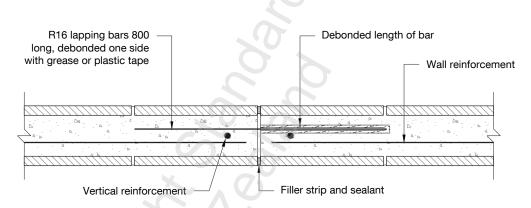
Control joint detail for solid-filled walls and partially filled walls where horizontal bars are placed between floors but not bond beams (see 12.1.3)
